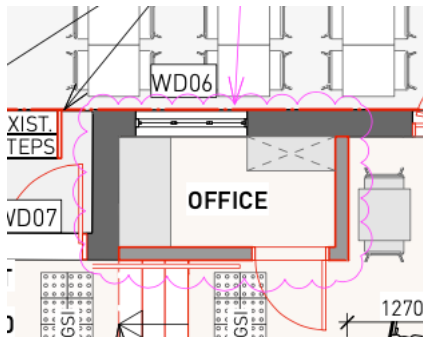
, Ground Floor: Proposed office with staff lockers. External window W006 to remain
